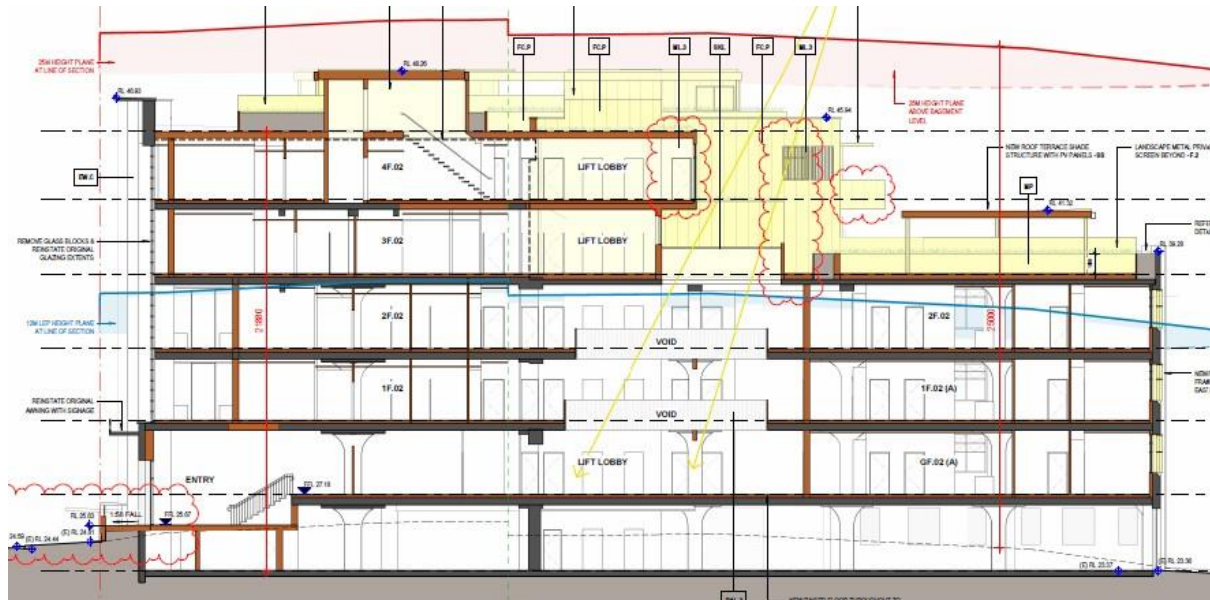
Section plan showing 12m height standard (blue line) in relation to existing building and proposed additions at roof level.
